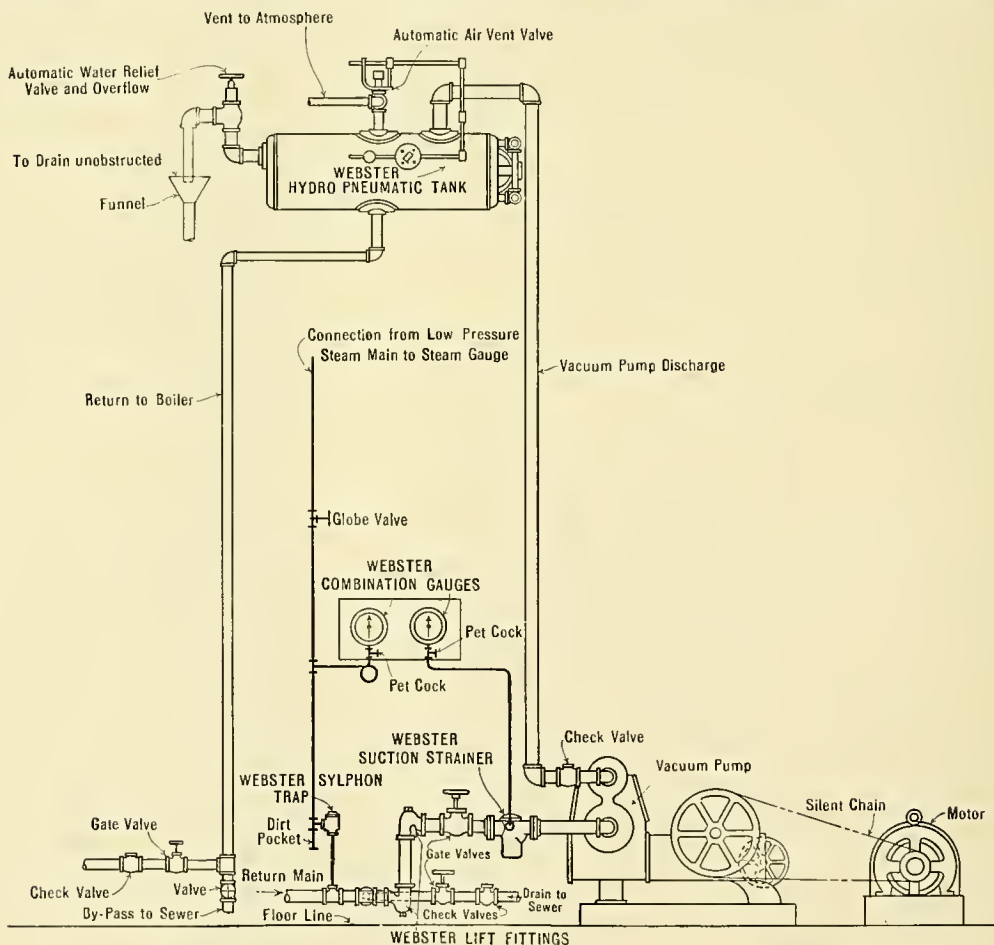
Method of connecting geared-type vacuum pump and Webster Single-control Hydro-pneumatic Tank
